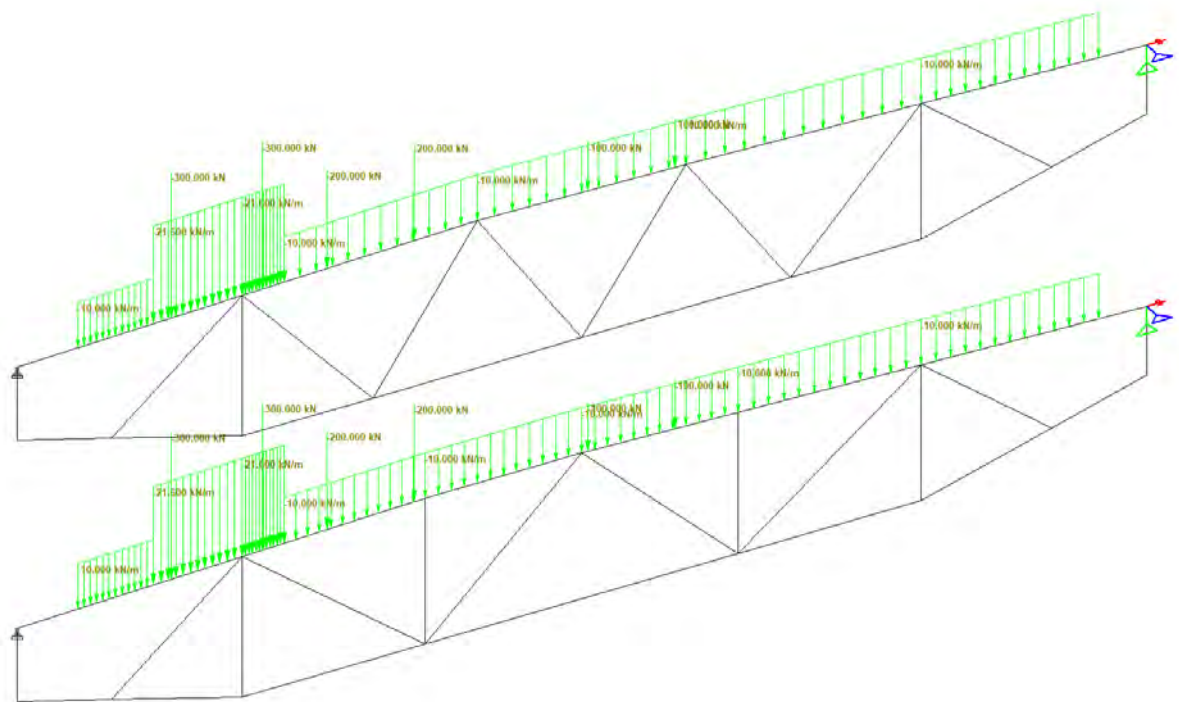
Traffic loads on bridge girder with maximum traffic in lane 1
